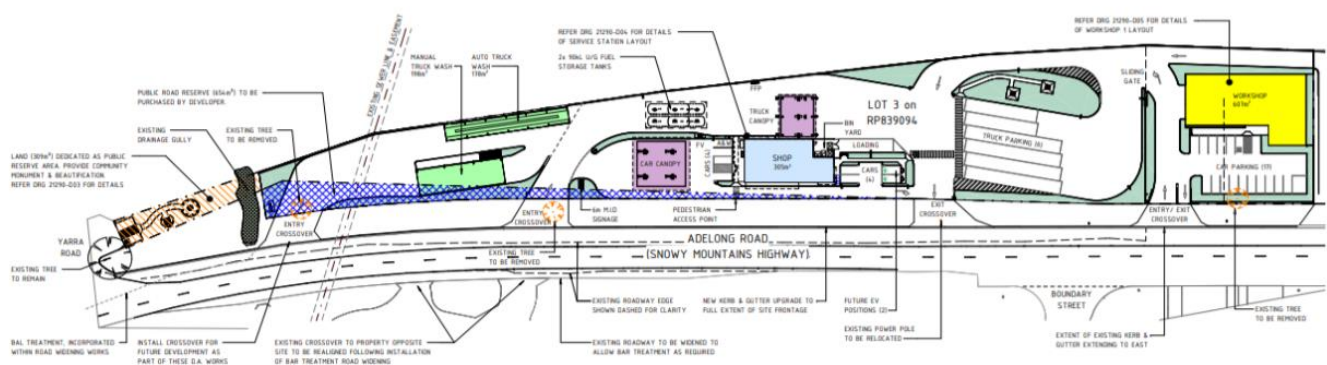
Concept layout for the proposed development (Source: site layout plan, 2022)
